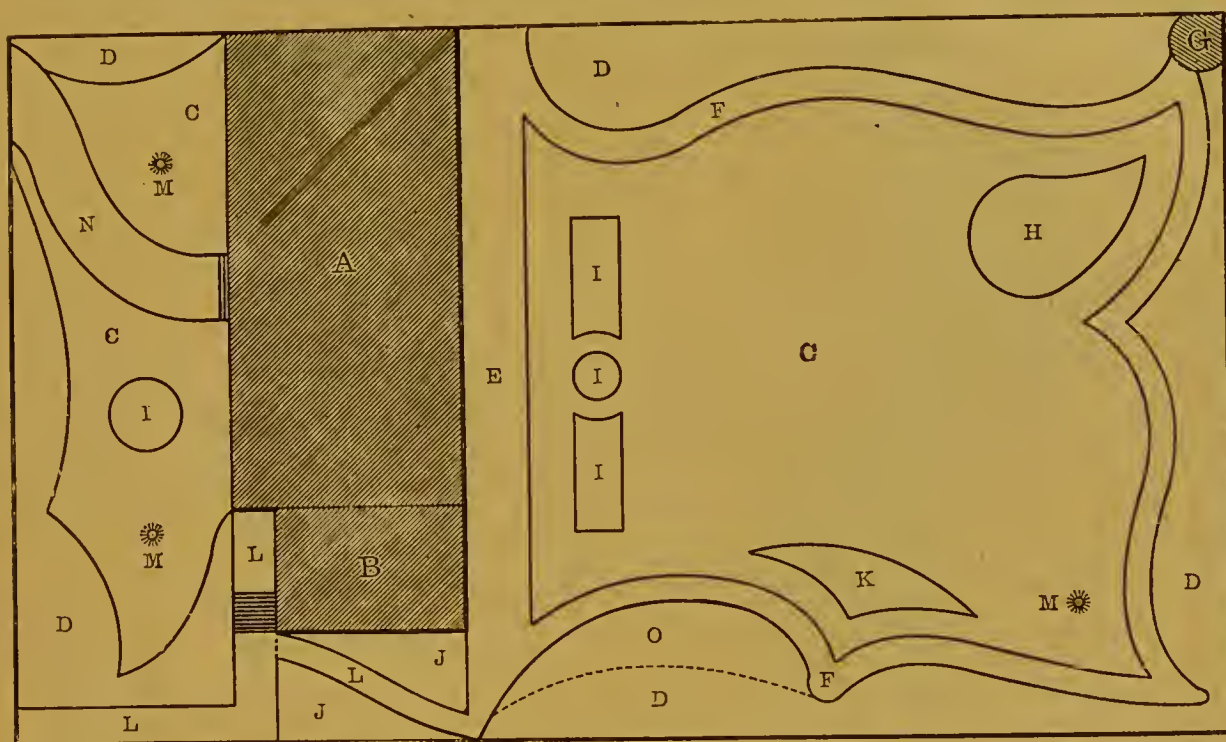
PLAN FOR VILLA GARDEN. (Scale 30 feet = 1 inch.)
